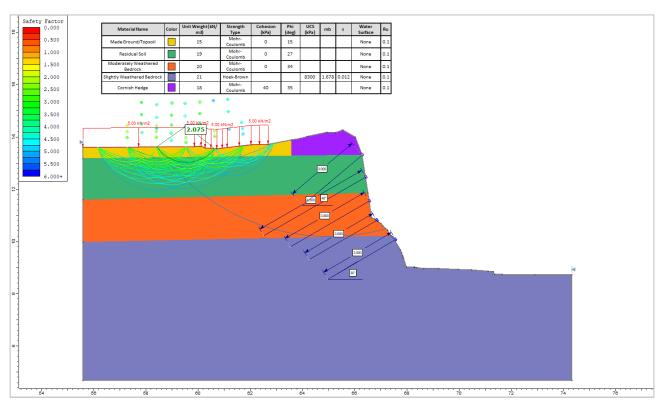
Section 4 – Facing Installation - BS8006 Set1
